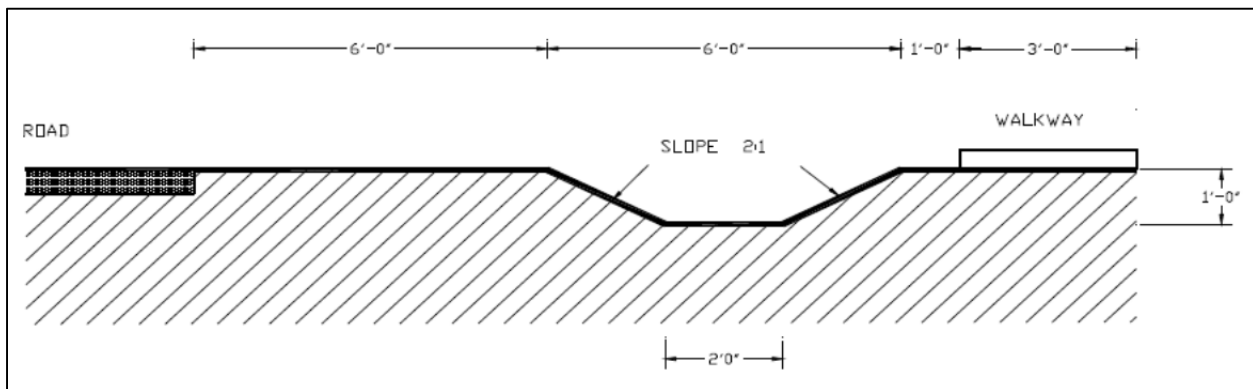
Typical section of trapezoidal drain¹⁴⁸
